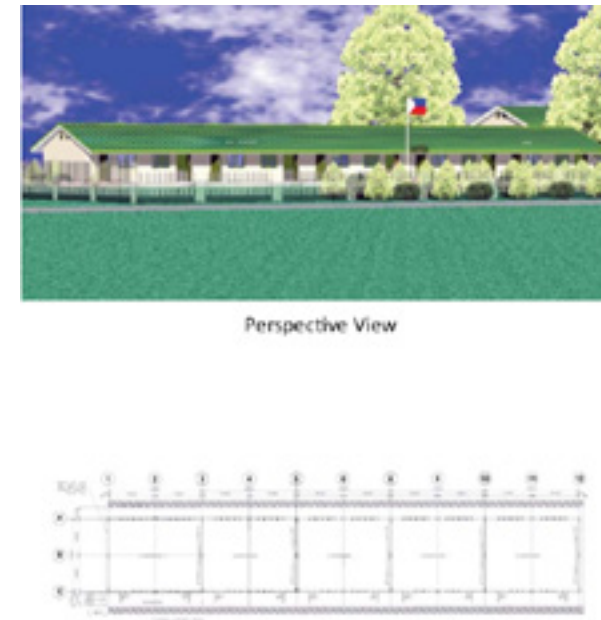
School module floorplan 5 classrooms (DepEd 2010)
